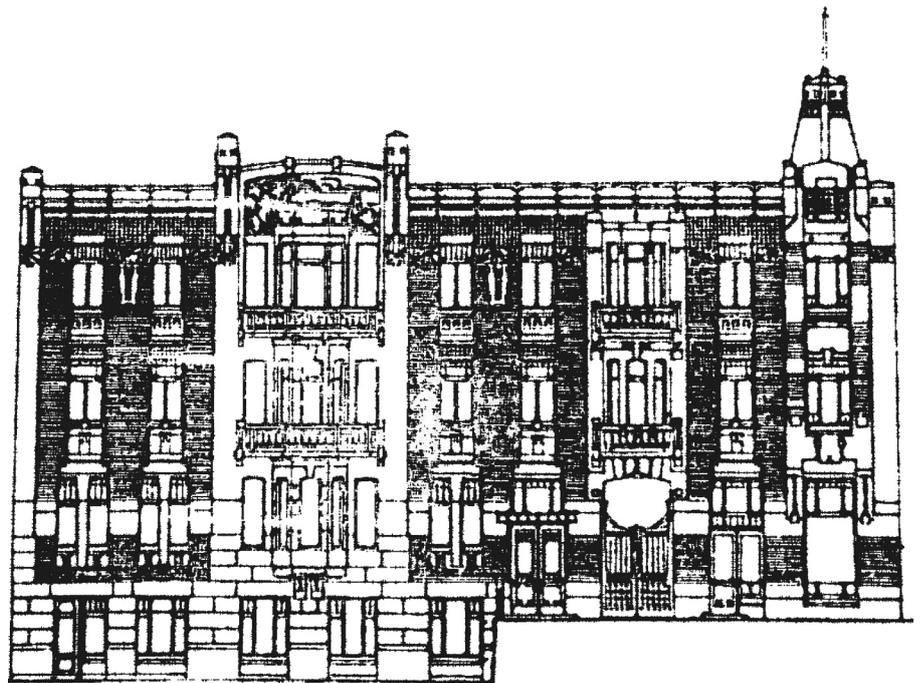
The main facade of the building on 15 Liuteranska Street. Prep. D. Kuśnierz-Krupa based on an archival drawing
